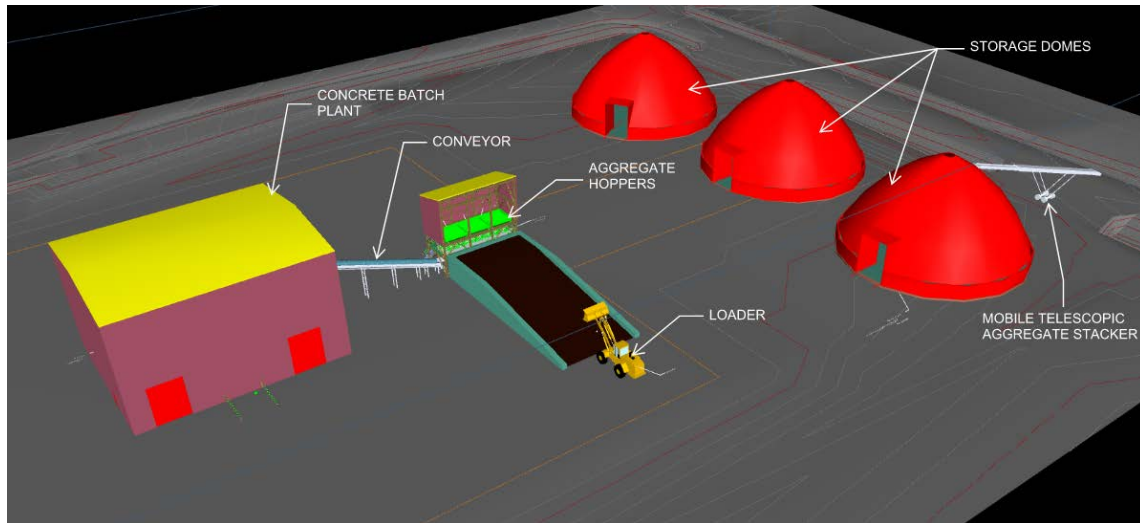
3D Model Overview of the Concrete Batch Plant
